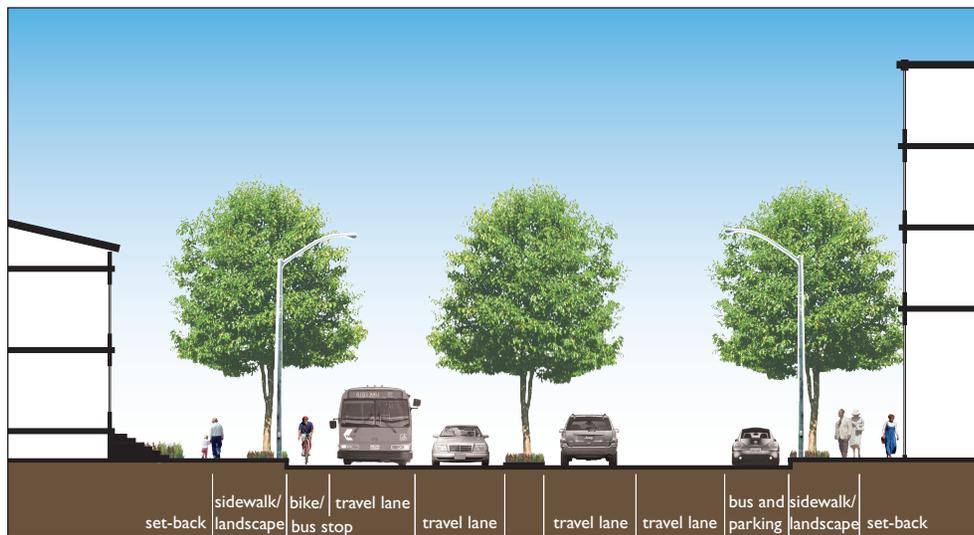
Boulevard Street with Median Conceptual Street Section
